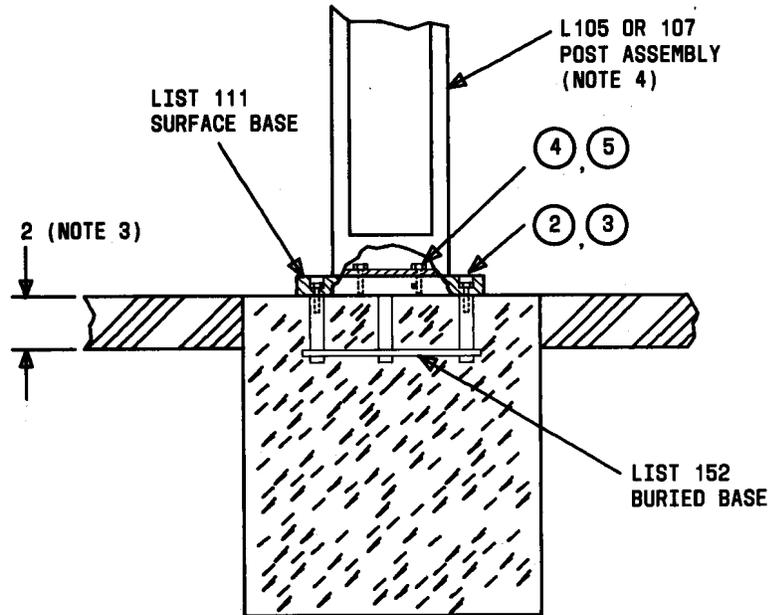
Concrete Foundation Requirements For Surface Mount Post or List 52 or 152 Buried Base (Sheet 1 of 2)
